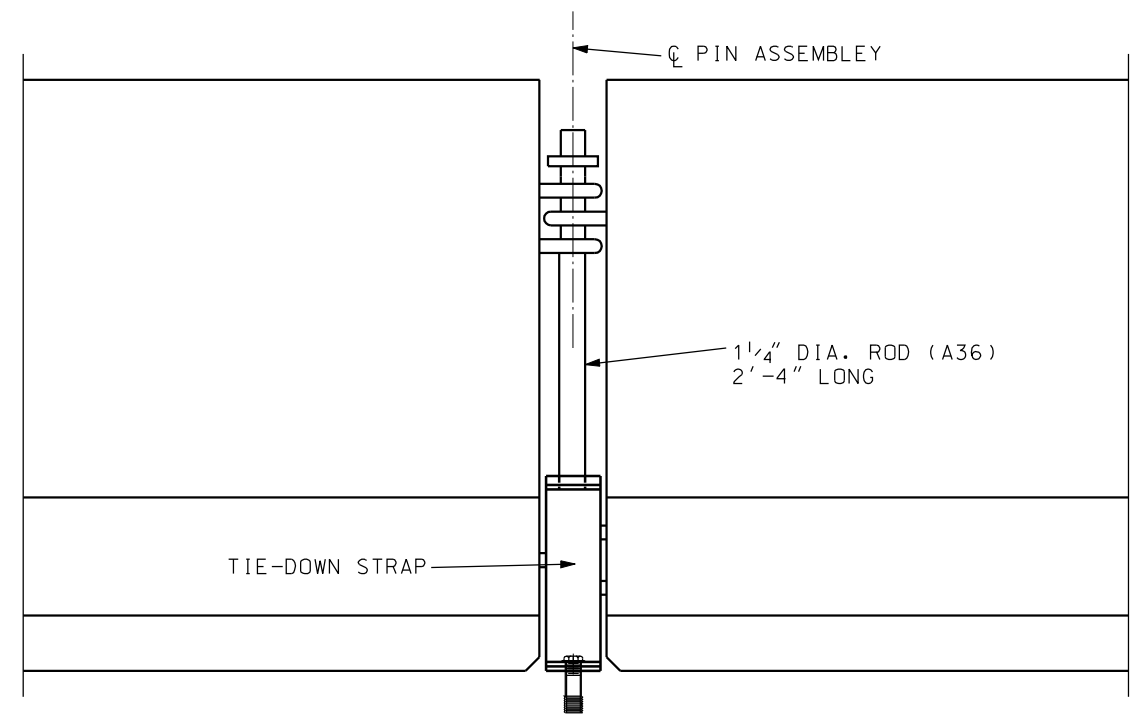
DETAILS OF TYPE F TEMPORARY BARRIER TIE-DOWN STRAP
